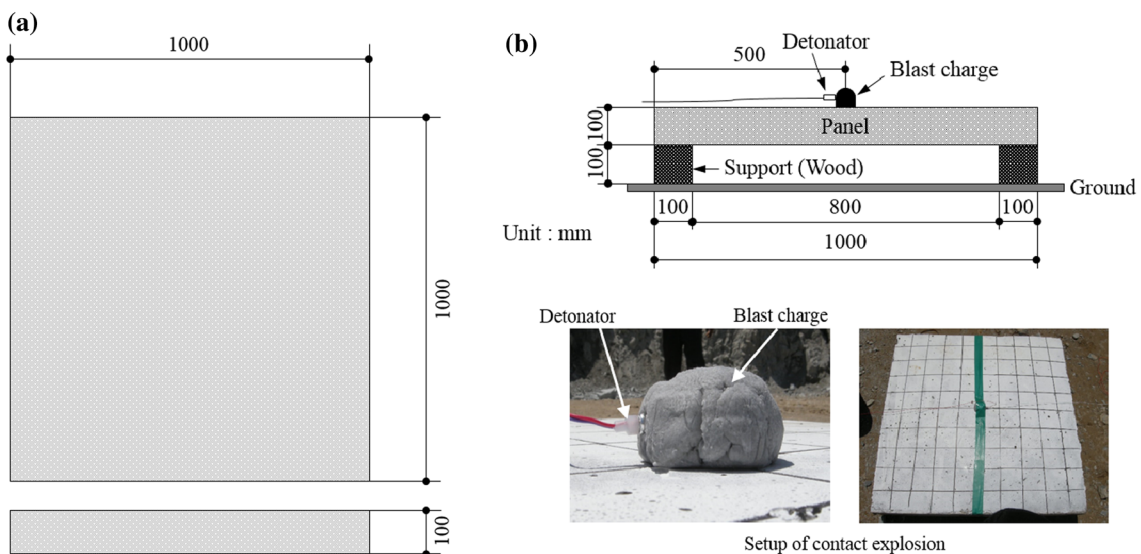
Experimental setup of blast resistance; a dimension of panel, b contact explosion.
